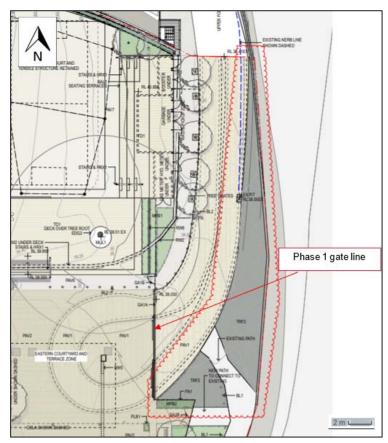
| Proposed phase 1 entry treatment (Source: Applicant's SRtS 2020)
